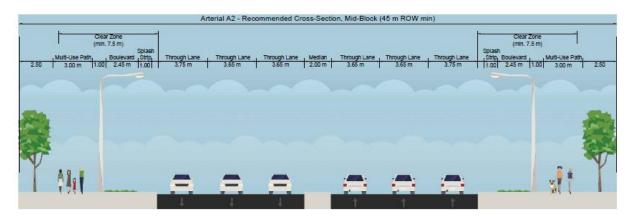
Arterial A2 – Recommended Cross-Section, Midblock
